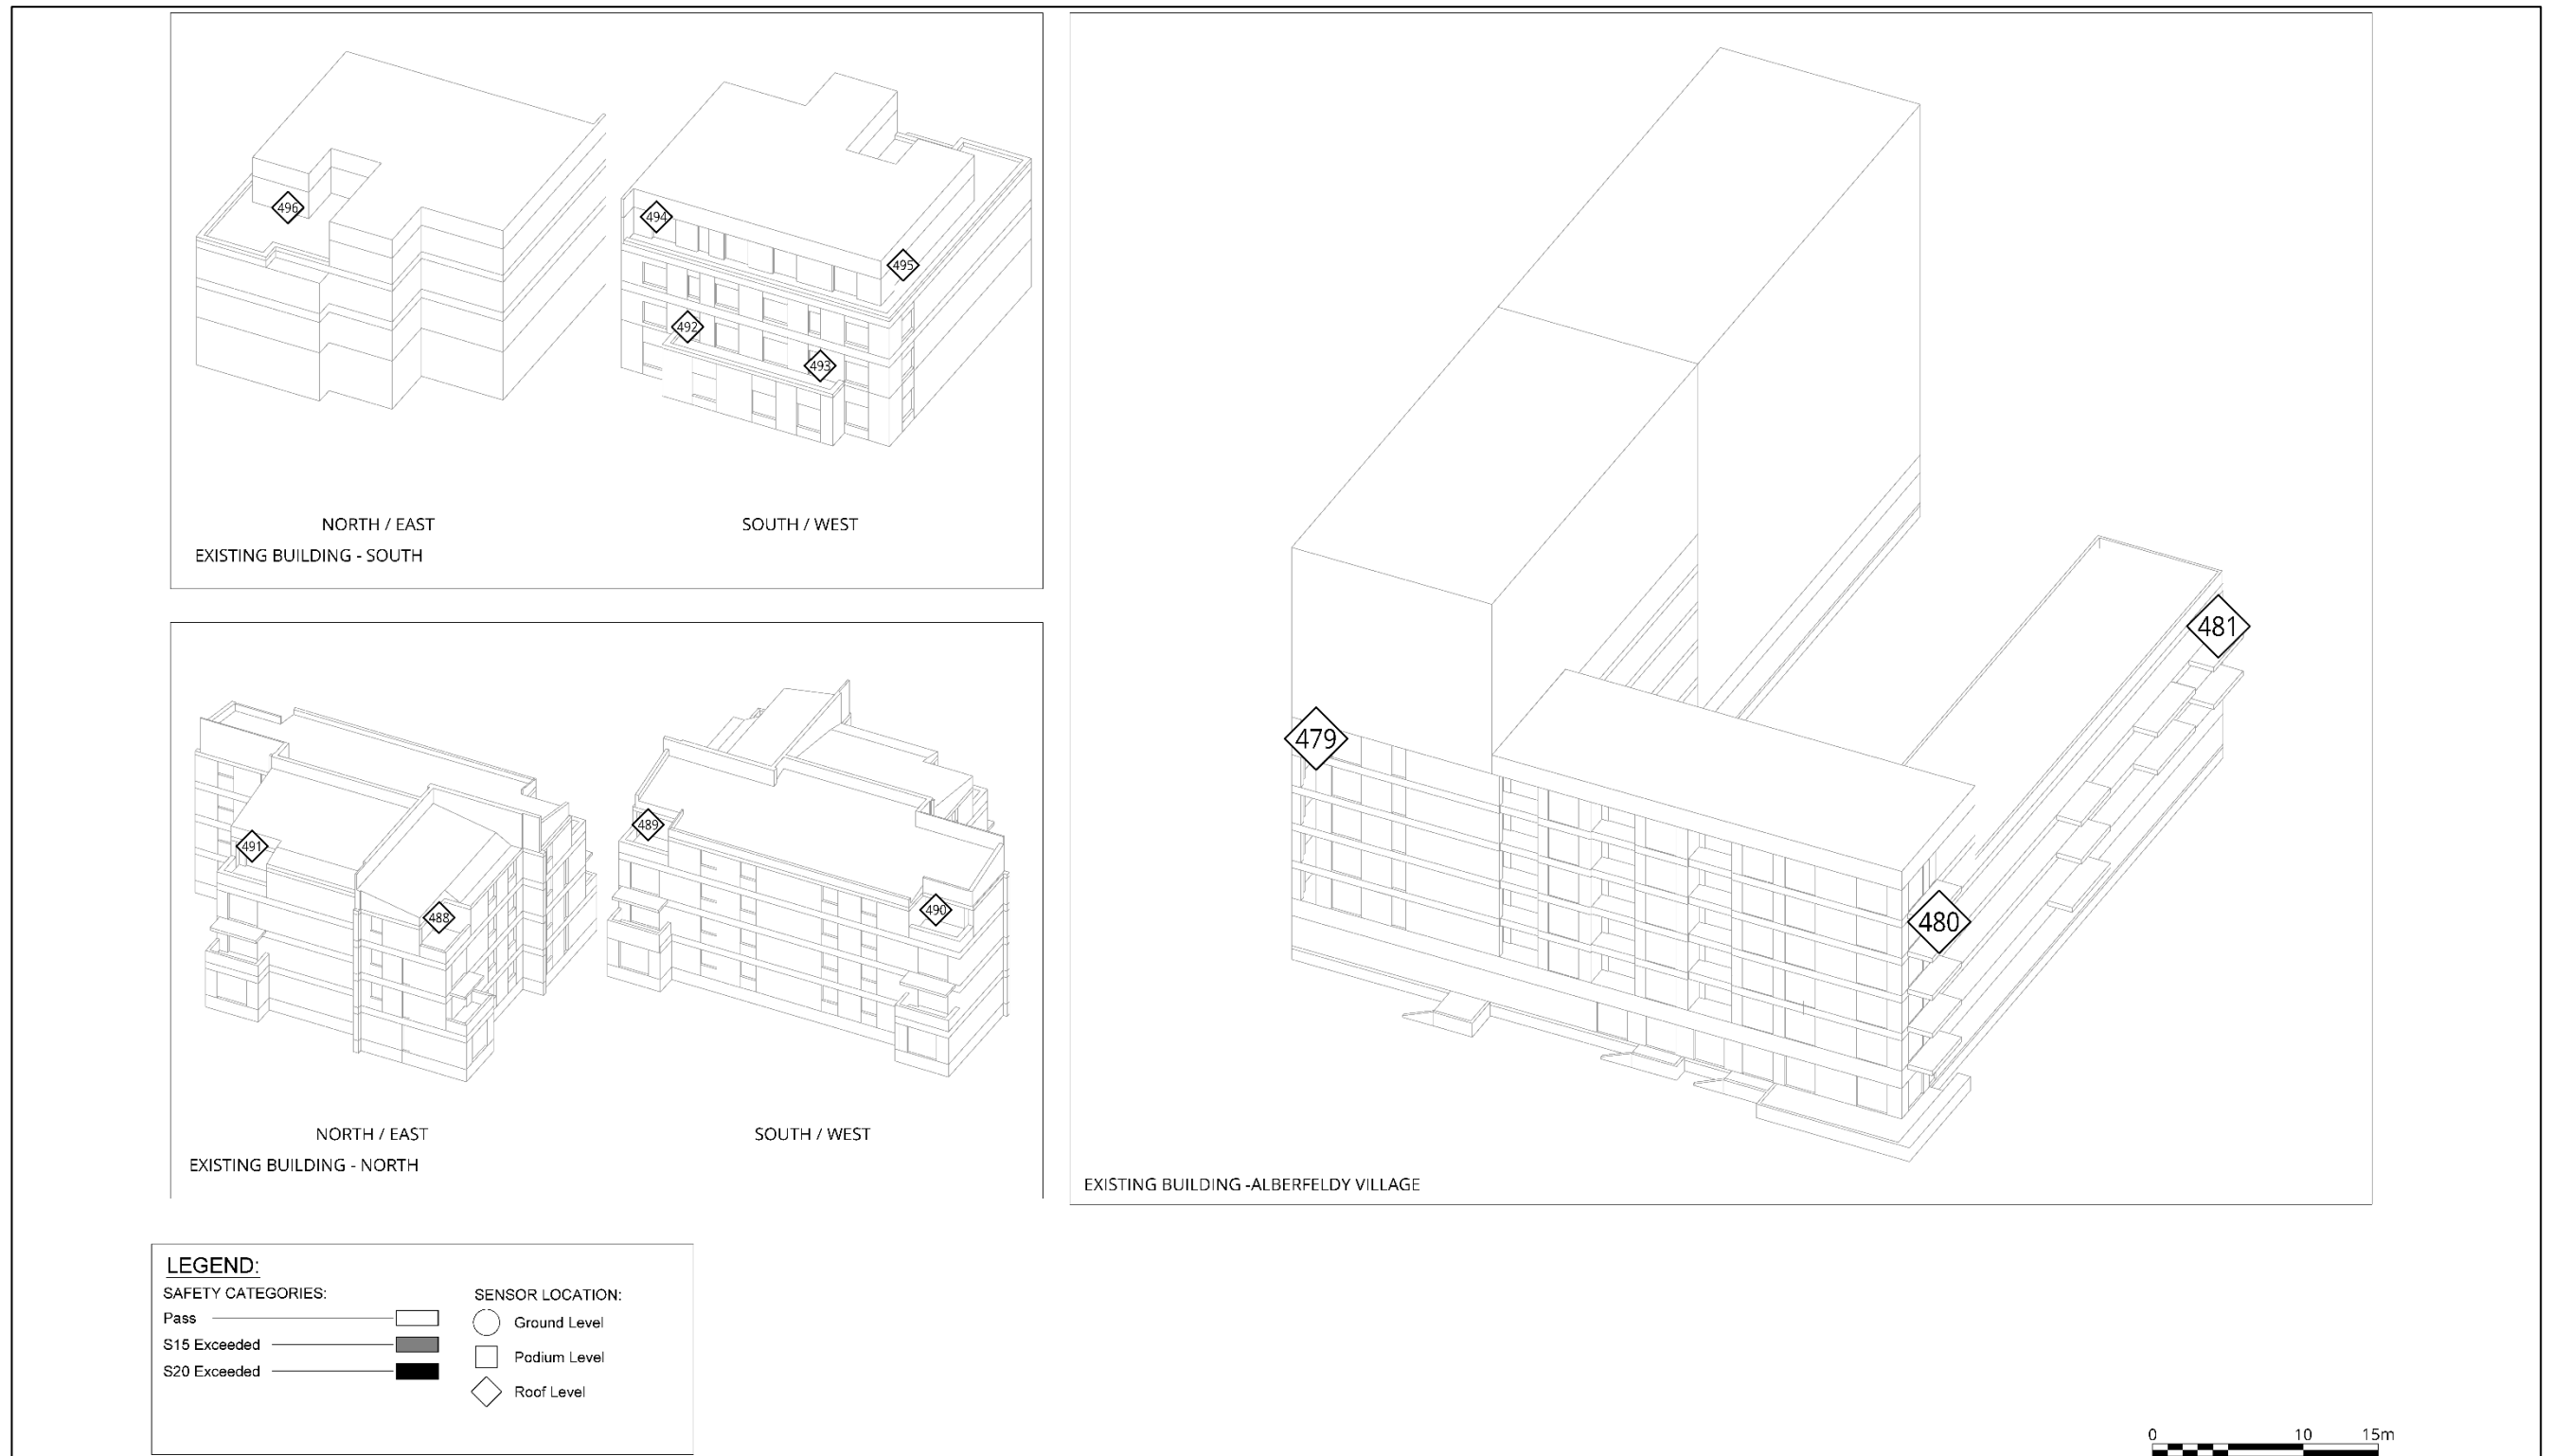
Configuration 1: Existing Site with Existing Surrounding Buildings – Elevated Levels (Strong Winds)
